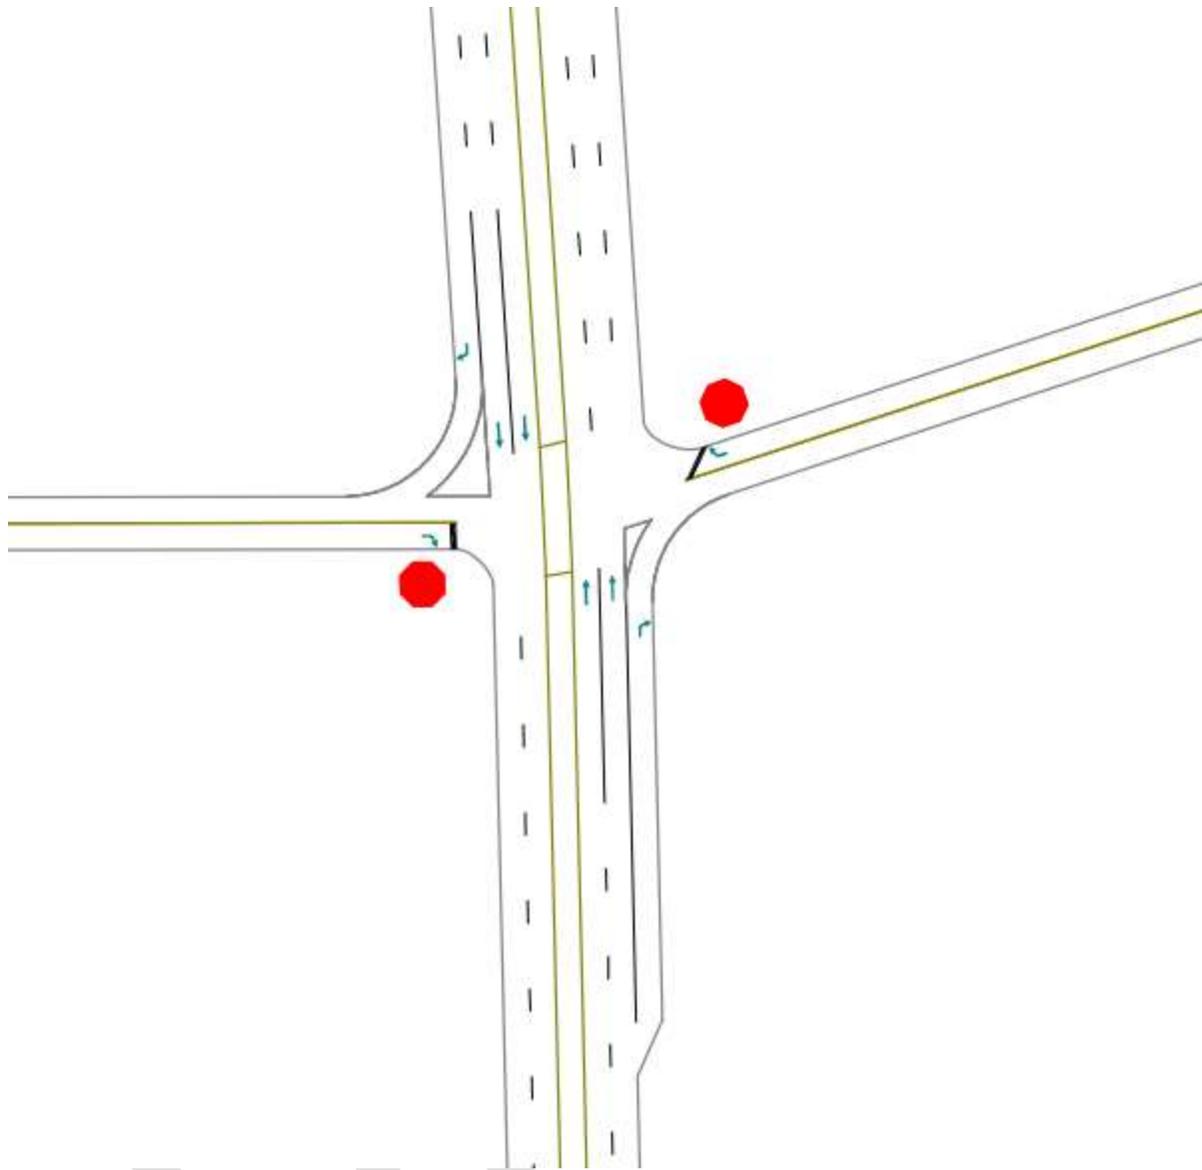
SR 9 & 24th Street SE Alternative A Conceptual Layout
